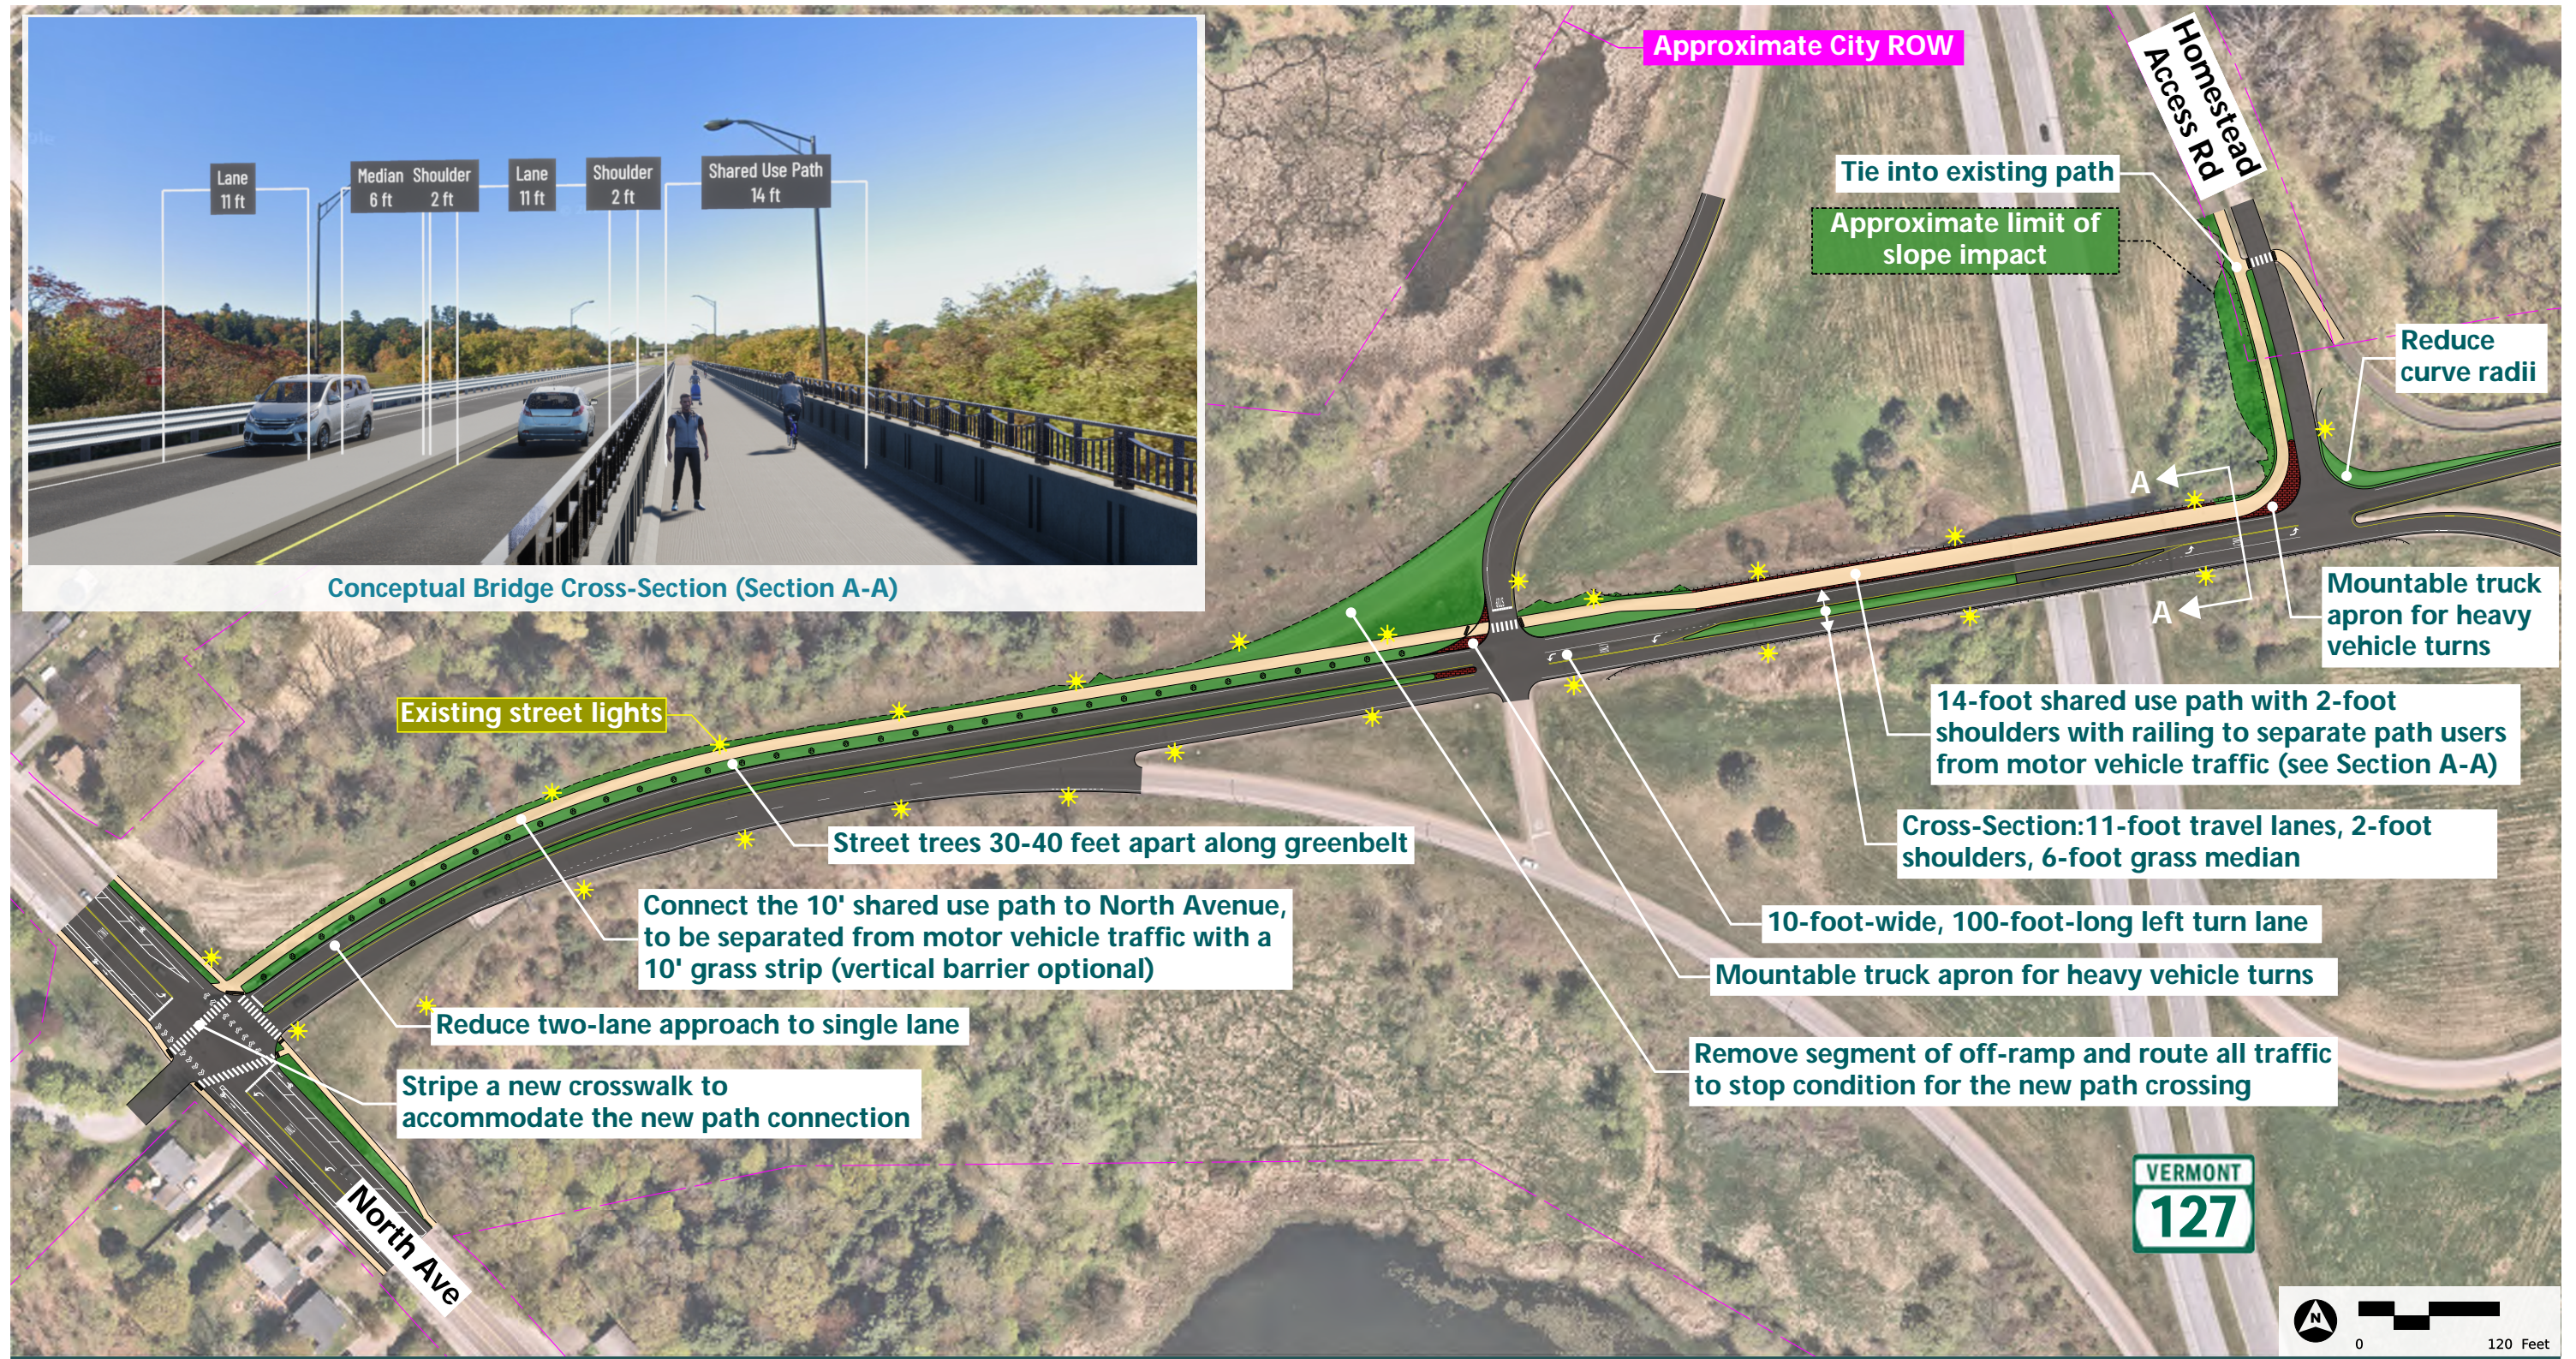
Conceptual Layout Plan of the Preferred Alternative
